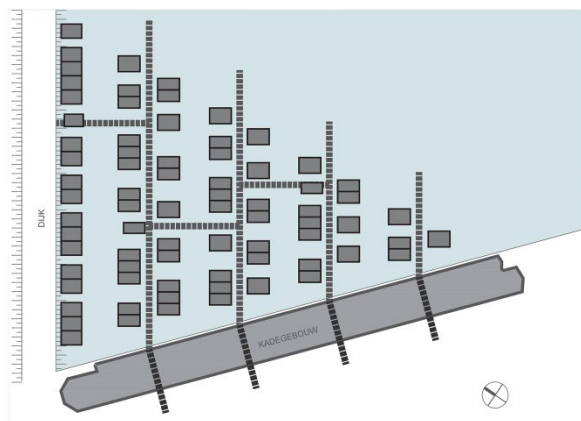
Scheme of the site plan of the western part of the Waterbuurt neighbourhood (author)
